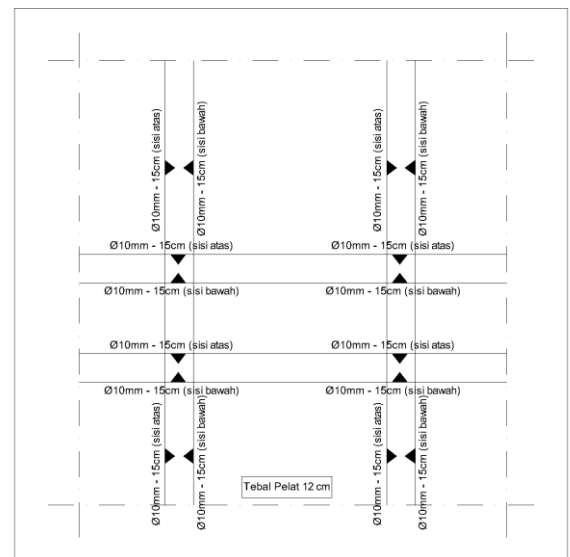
Details of Reinforcement of Floor Plates 1, 2 and 3
